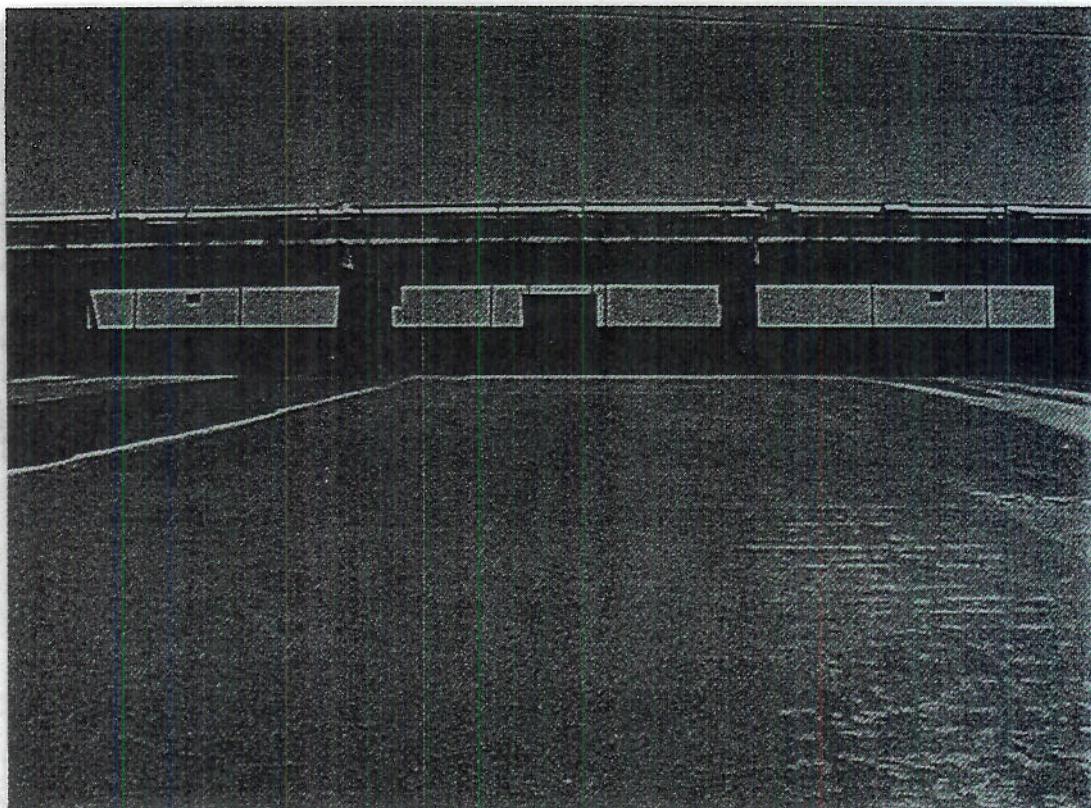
Cooling Lake Dam – looking west, downstream of dam.
